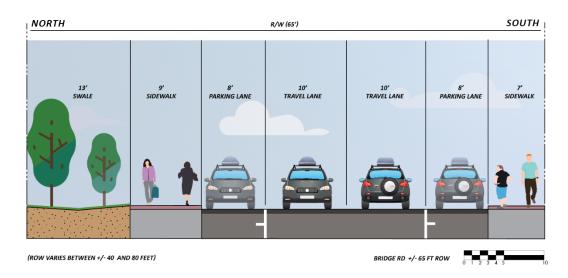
Existing Urban Typical Section for CR-708/Bridge Road
